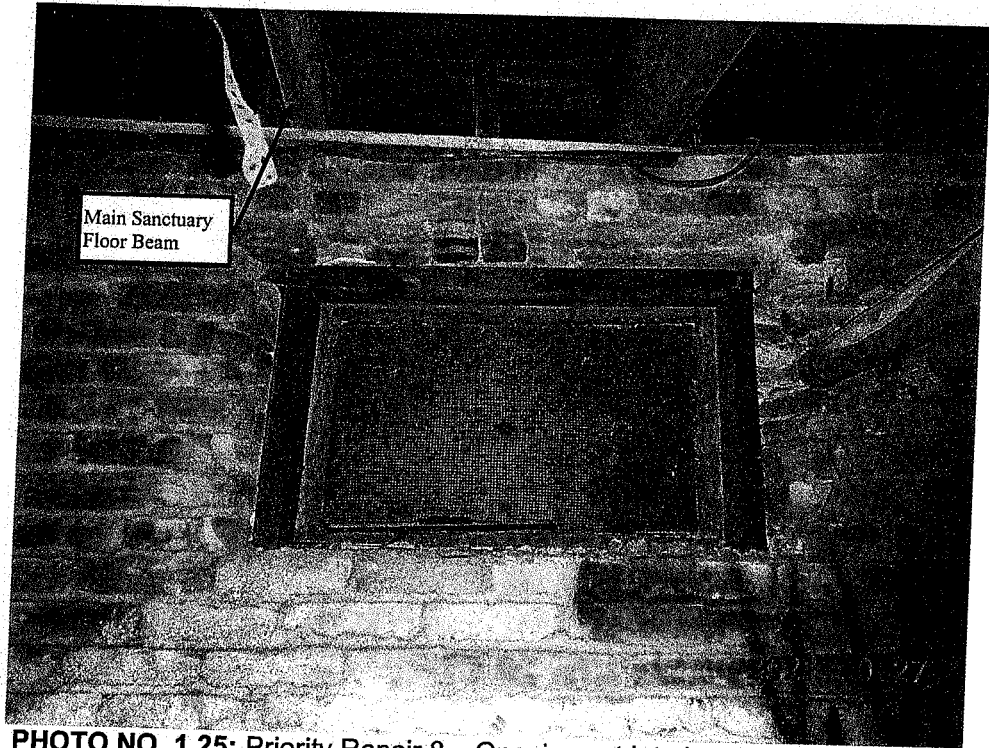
Priority Repair 8 – Opening cut into load bearing brick masonry wall with no lintel – Lower Level, Grid B/6
